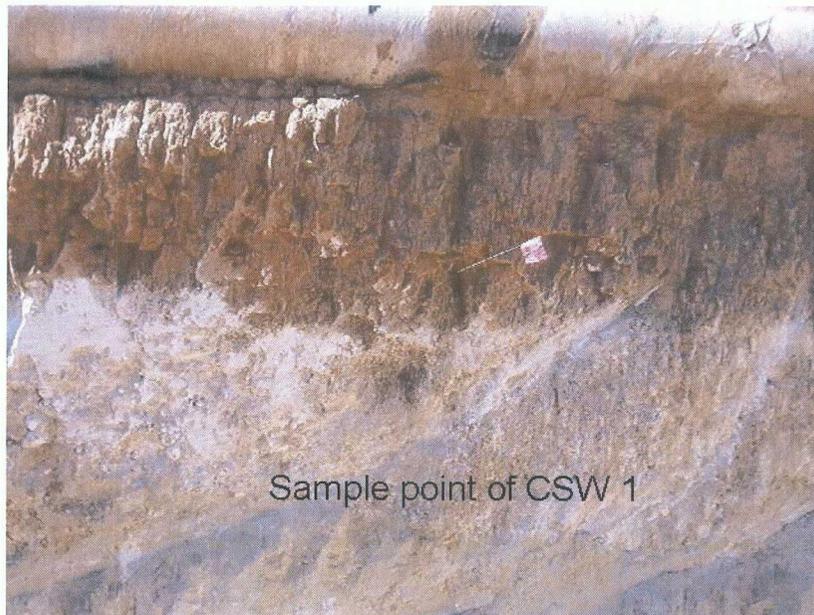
Northwest corner of excavation, prior to over excavation activities.
